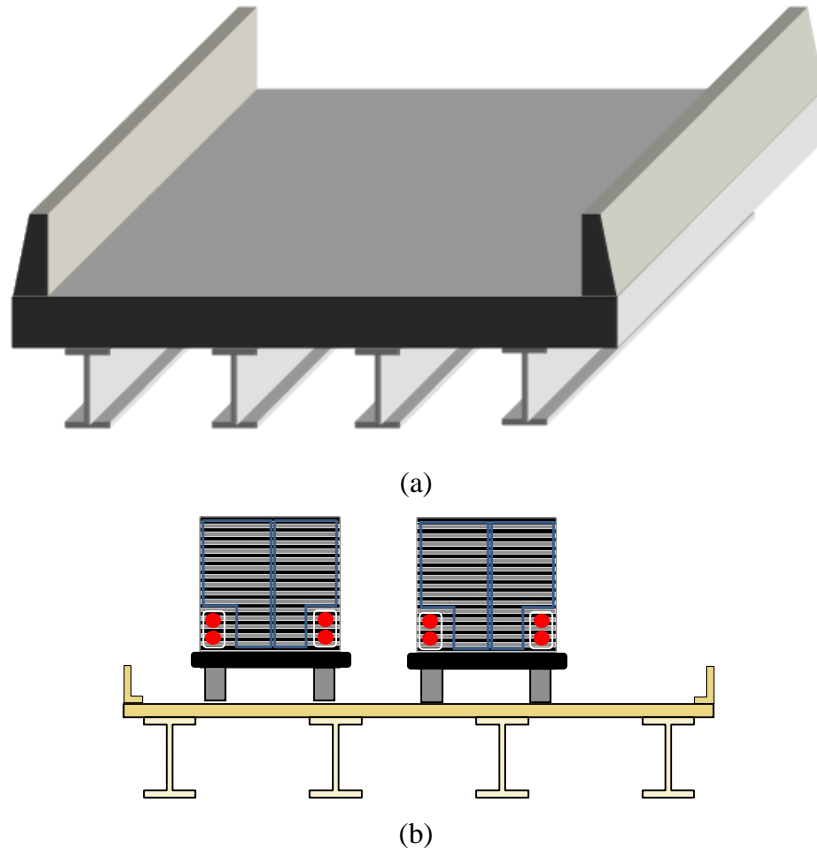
Slab-on-girder bridge (a) 3D view, (b) cross-section
